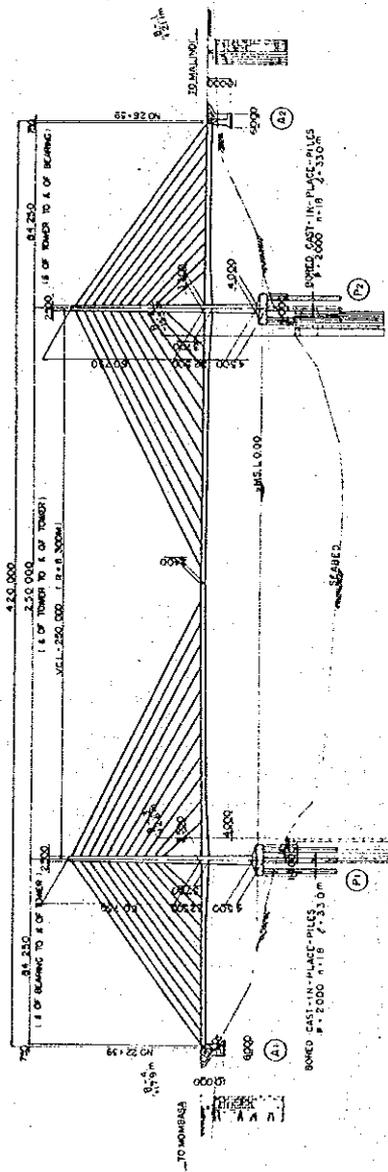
PROFILE AND SUBSURFACE CONDITION AROUND ABUTMENTS
